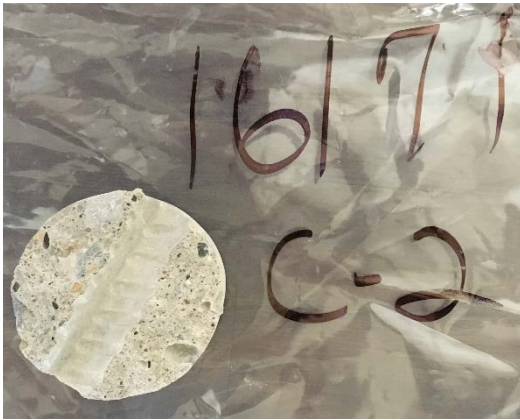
Photos of the concrete cores for Bridges 13321 (Newer Bridge).
